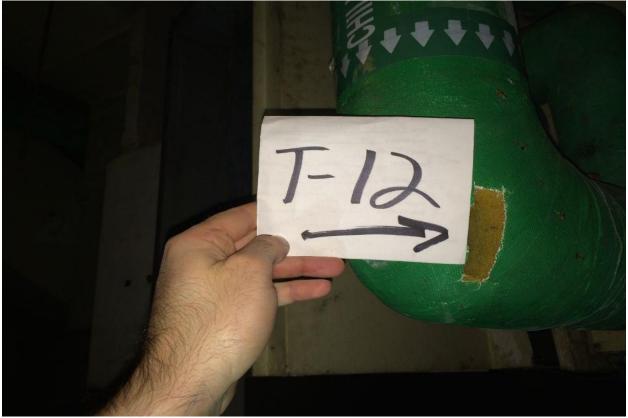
Laboratory analyses did not detect asbestos minerals within plumbing insulation sample TS-12 collected from the Theatre Building basement boiler room.
